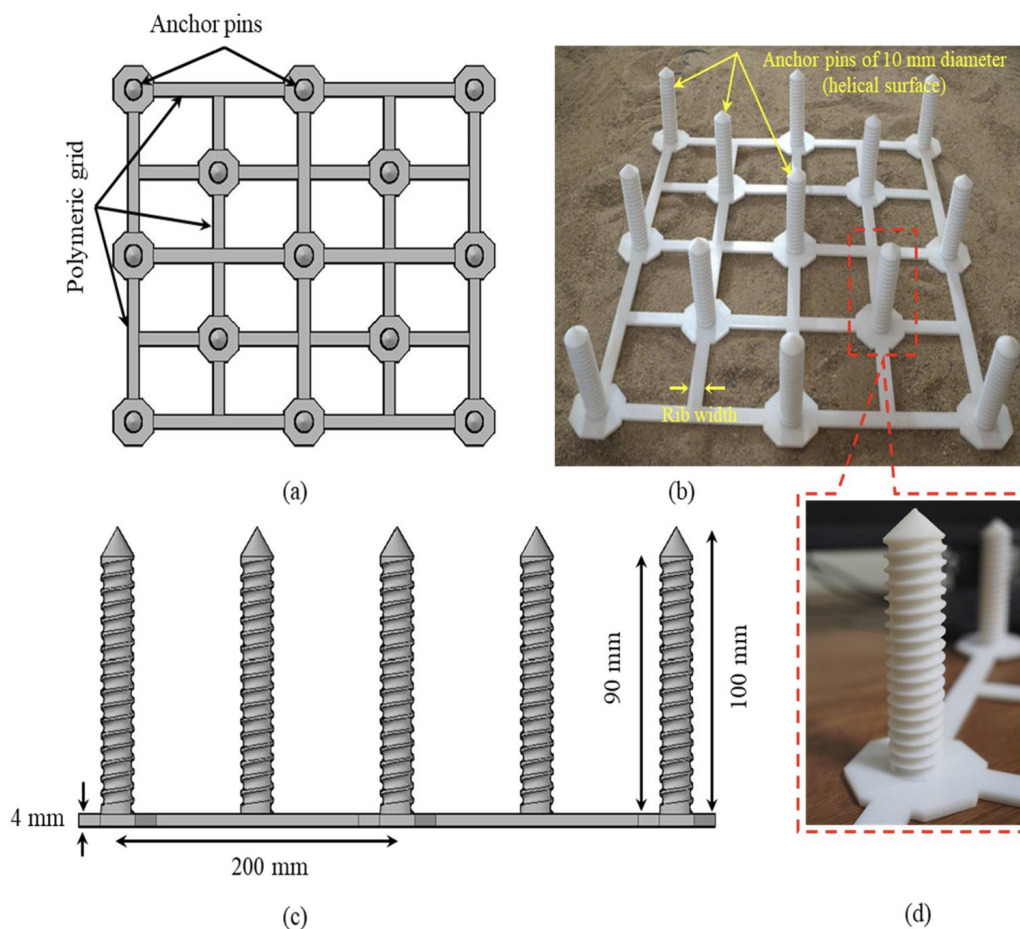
Details of Geocell Anchor Cage (a) plan view (b) perspective view (c) sectional elevation (d) close-up view of the pin
